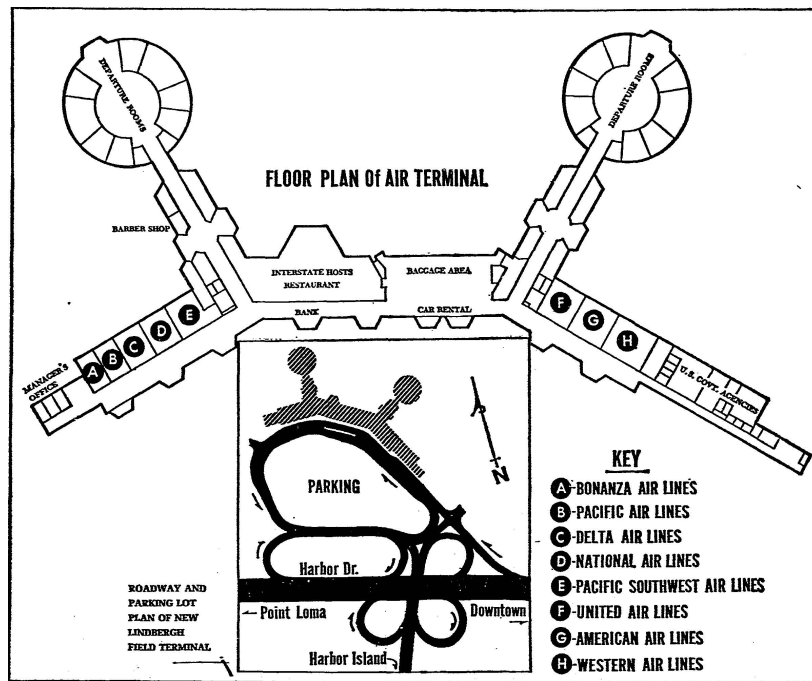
1967 floor plan of Terminal 1. (Drawing courtesy of San Diego Union 1967f)
